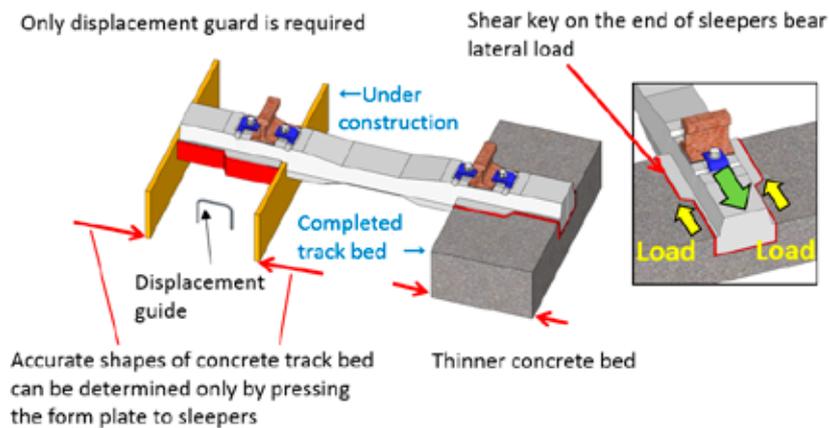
Newly-constructed concrete-bed track with s-shaped sleeper
